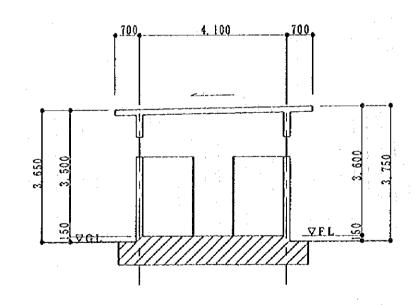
Plan of Fish Handling Shed and Ice Storage
